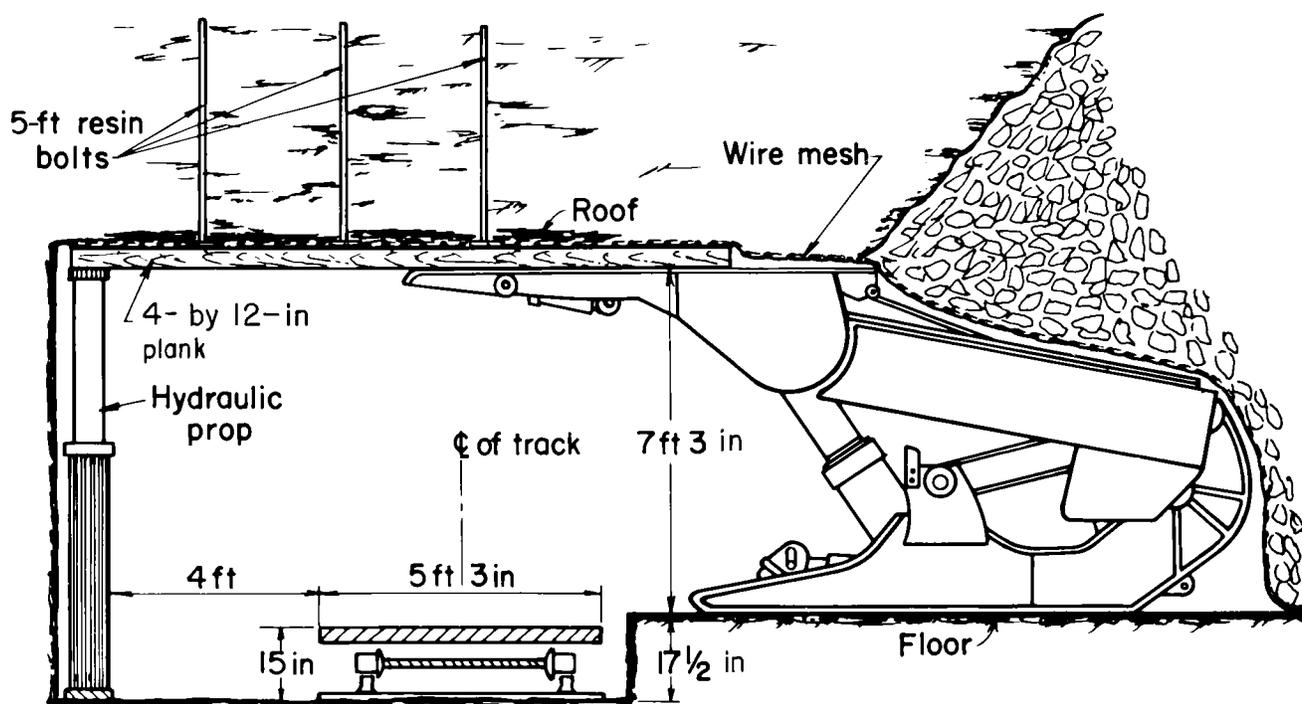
Recovery area secured with wire mesh, bridge boards, and roof bolts.
